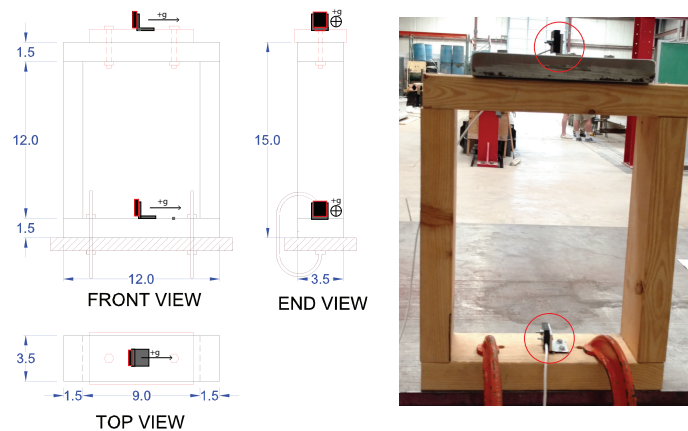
Test configuration for a frame timber joint specimen; all dimensions are in inches
